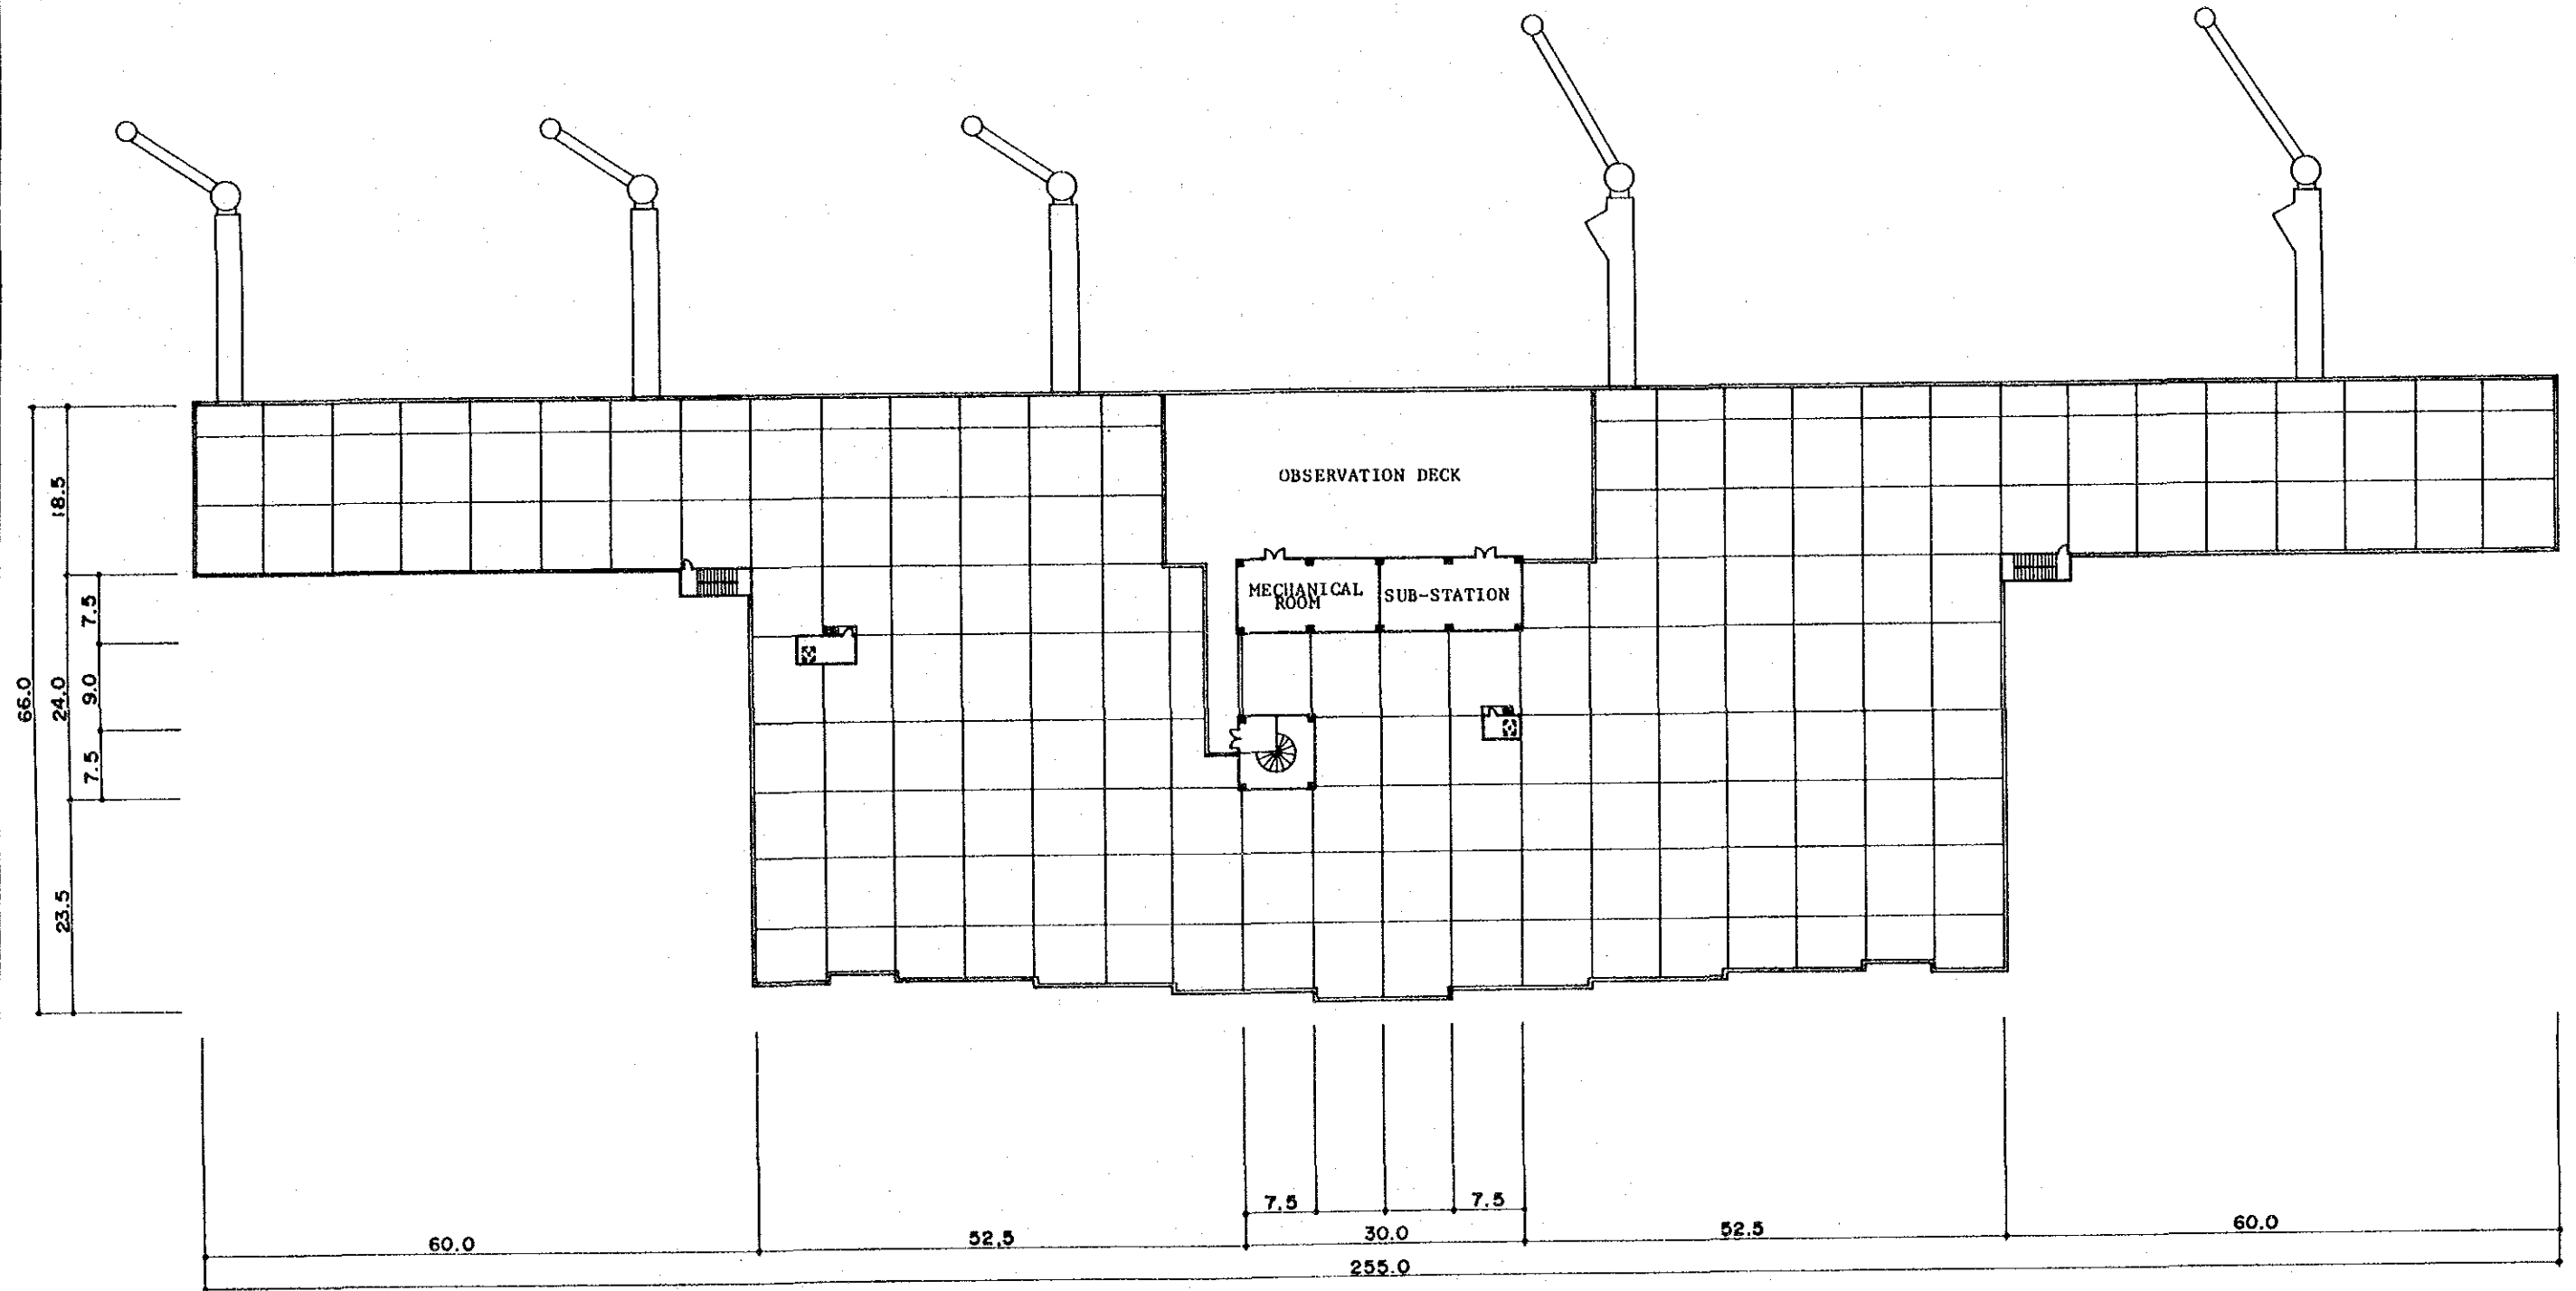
Passenger Terminal Building 2nd Floor Plan
